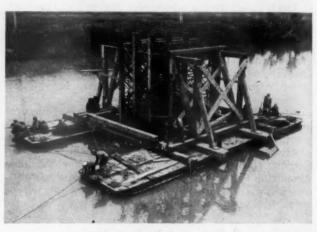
Intermediate Piers Were Constructed of British Military Railway Steel Trestling, Supported on Special Camel's Foot Adjustable Bearings
